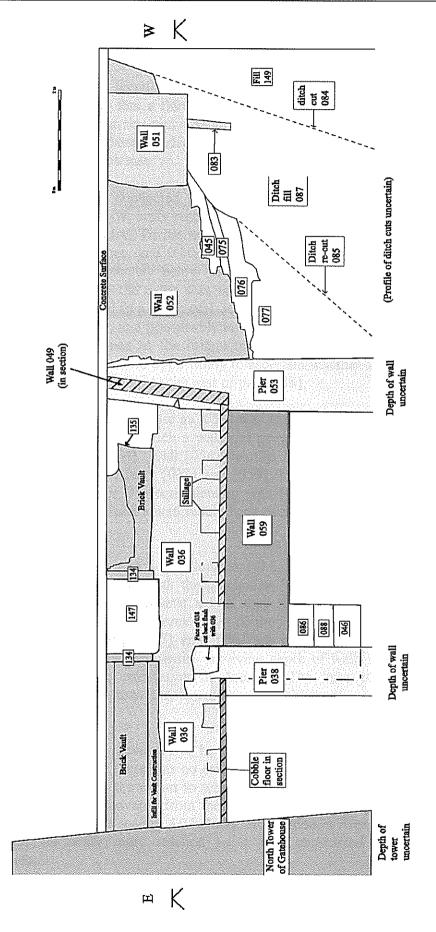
Schematic elevation of north-facing side of bridge/causeway
